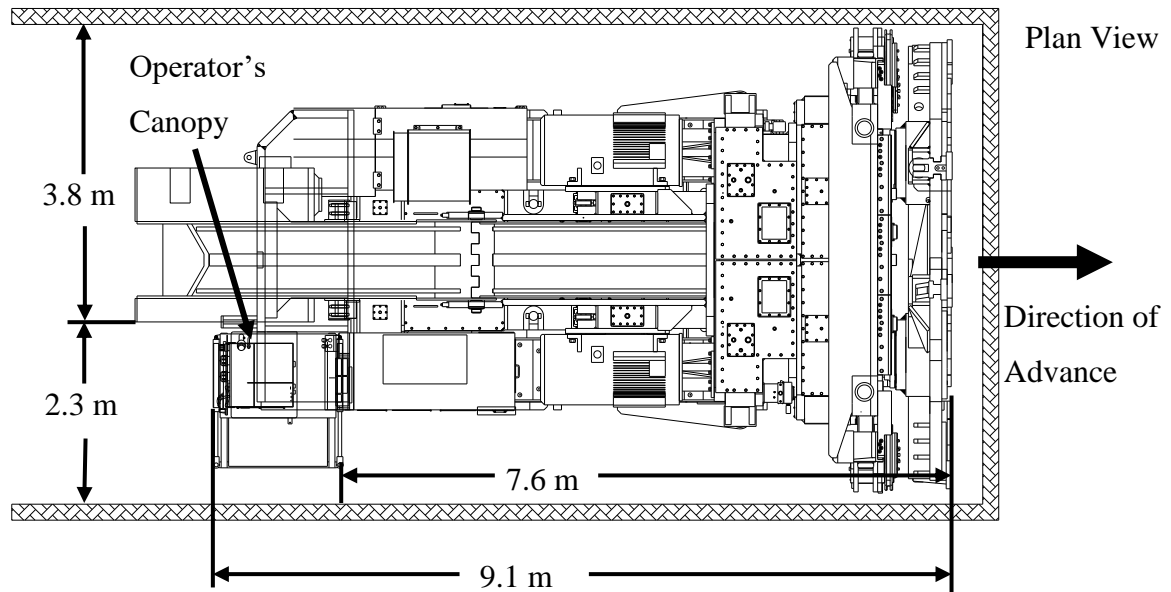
Geometric constraints of the boring machine for bolt installation. Installation of the mechanical bolts used by the potash mines in Saskatchewan requires more distance from the back than is available above any part of the boring machine. There is additionally not enough space beside the boring machine to install bolt installation equipment because the sides of the machine can get much too close to the sides of the tunnel at various points while mining. Partial bolting systems, and all systems in the first pass of a two-pass room, bolts installed above or to the left of the conveyor system are in the way of the boring machine when cutting the second pass. This results in bolts being cut and damage to the boring machine and therefore cannot be done. Bolts can only be installed behind the boring machine operator compartment for these reasons, 9.1 meters from the mine face and 3.8 meters from the left pillar.
